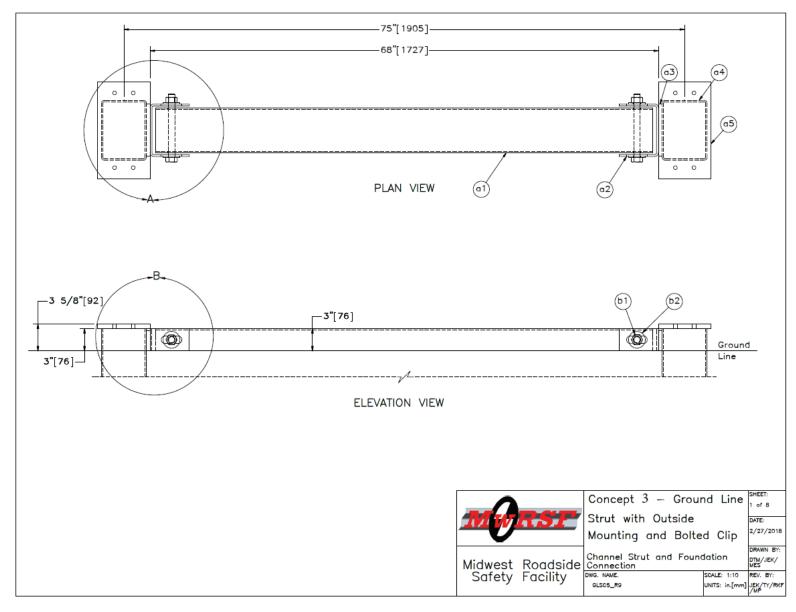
Ground Line Strut Design Concept No. 3 – Channel Strut and Foundation Connection
